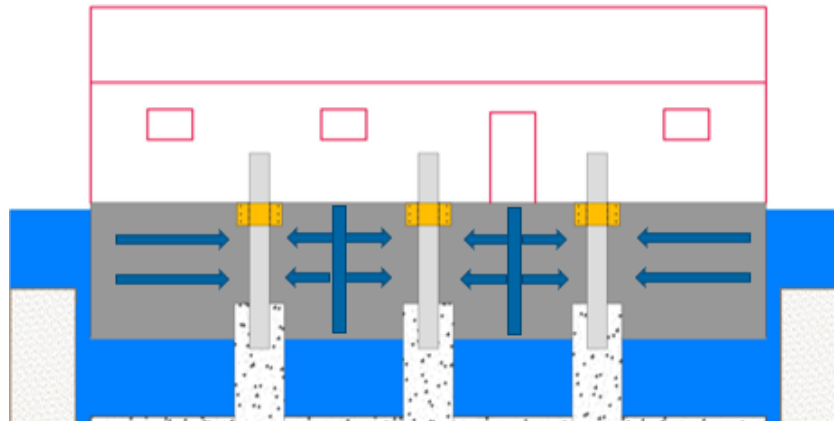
Flood loads striking the floating base being transferred to the guide posts.
